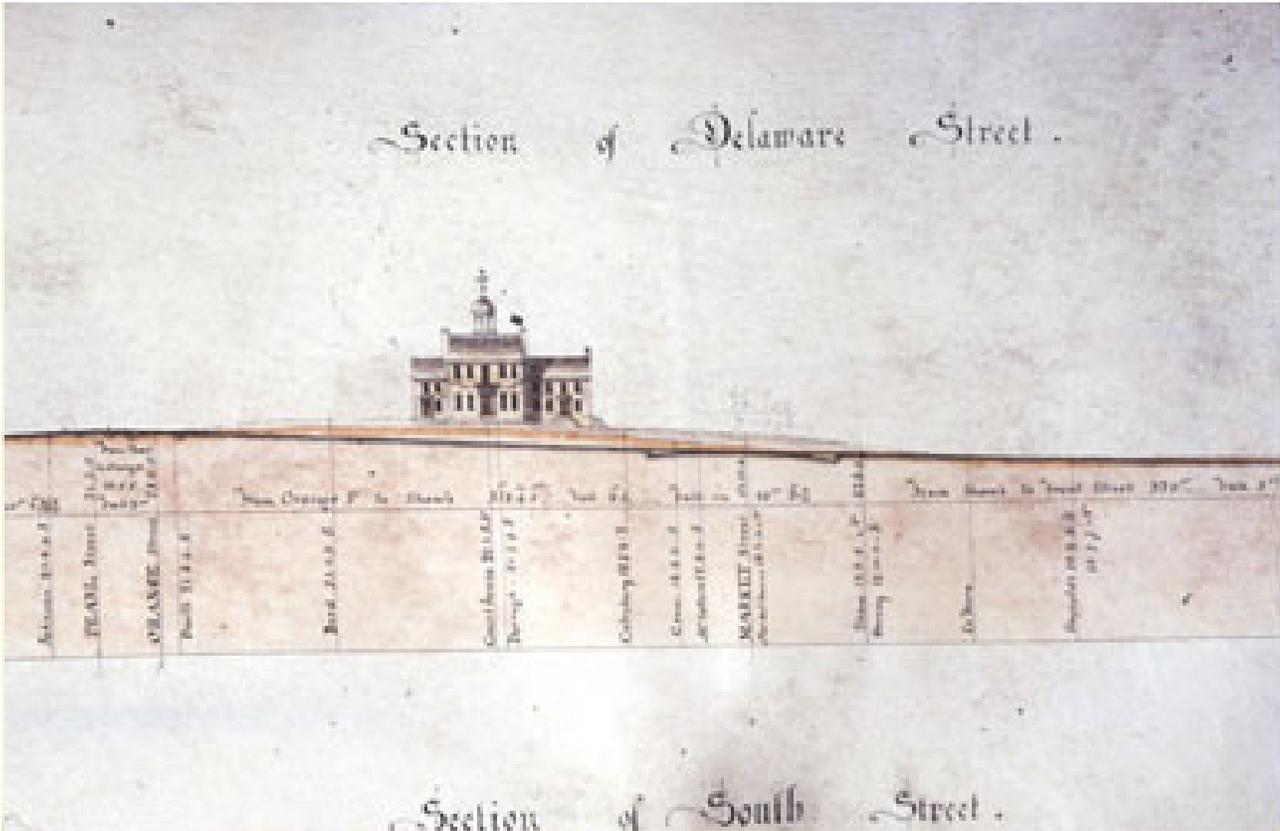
Section of Delaware Street, looking northeast. From Latrobe's 1805 "Plan of the Town of New Castle." (Delaware Public Archives)
